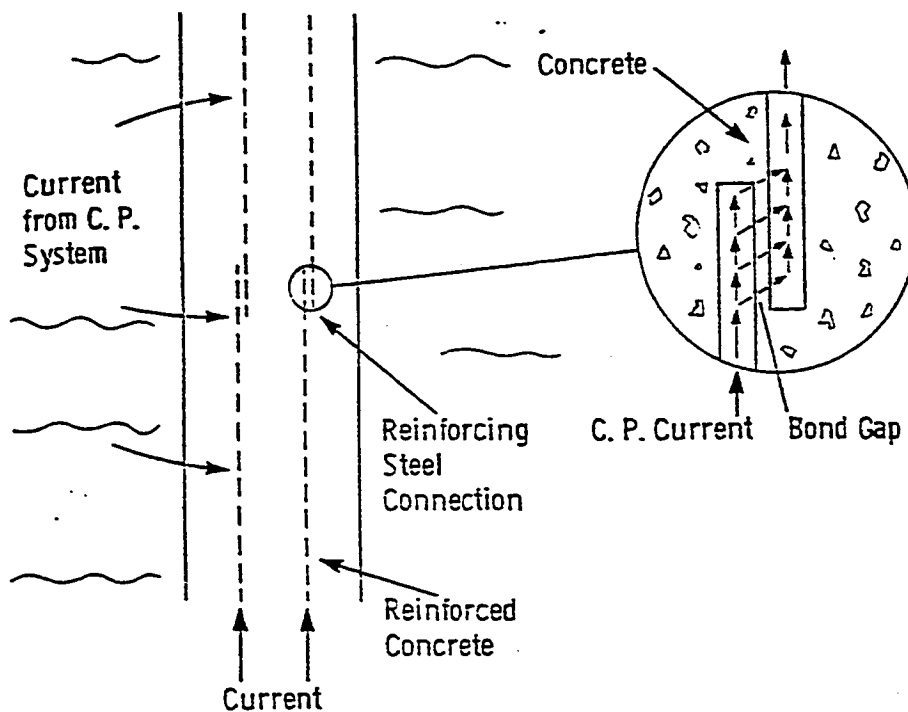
Schematic Illustration of a Pile Showing How a Lack of Electrical Continuity Between Reinforcing Steel Bars Can Lead to Local Corrosion Damage Under Conditions of Cathodic Protection
